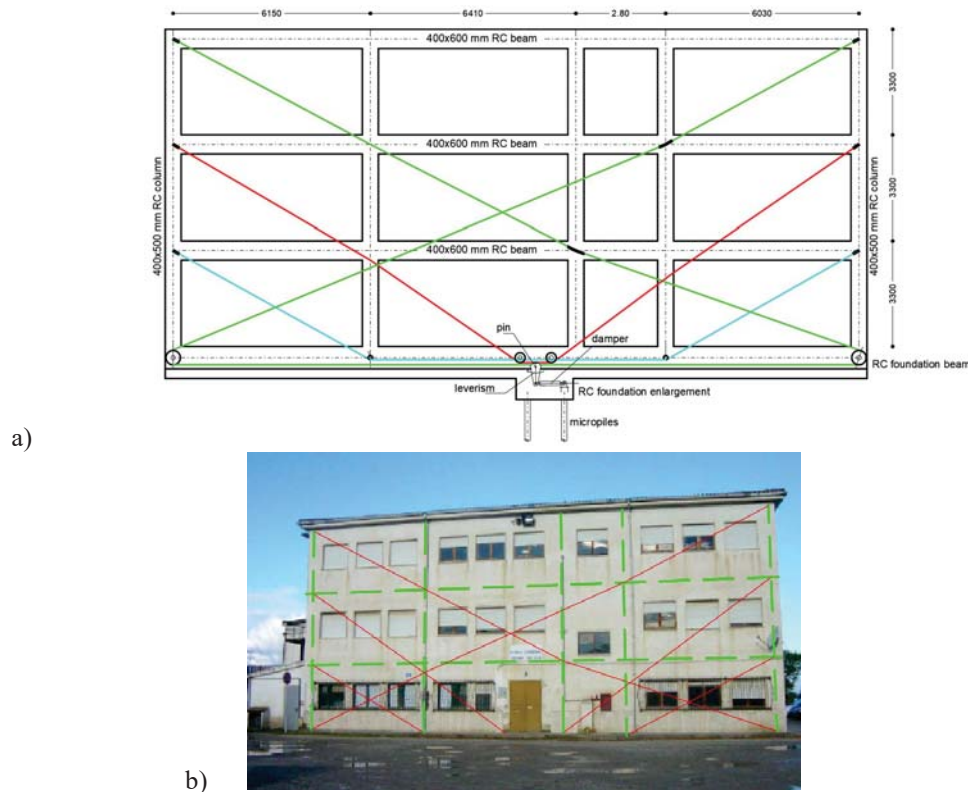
(a) System layout on the main RC frame of the benchmark building: in green, red and cyan are represented, respectively, steel cables linking the 3th, 2th, and 1th floor to the foundation of the building; (b) Cable system layout depicted on the building prospect: steel cables (red lines), RC frame (dashed green lines);
